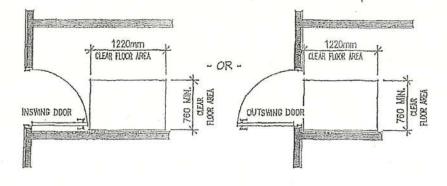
CLEAR FLOOR AREA BEYOND SWING OF DOOR
